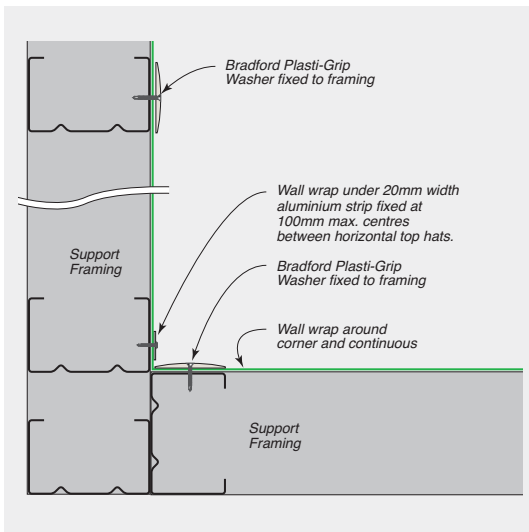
Internal Corner – Wall Wrap Overlapped
